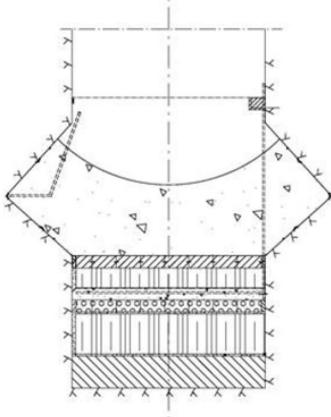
A design drawing of the full-scale demonstration ${f DOMPLU}$
